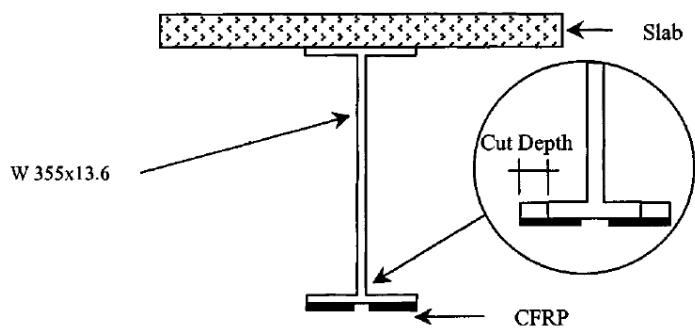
Repair of steel girders with CFRP (Liu et al. 2001)
